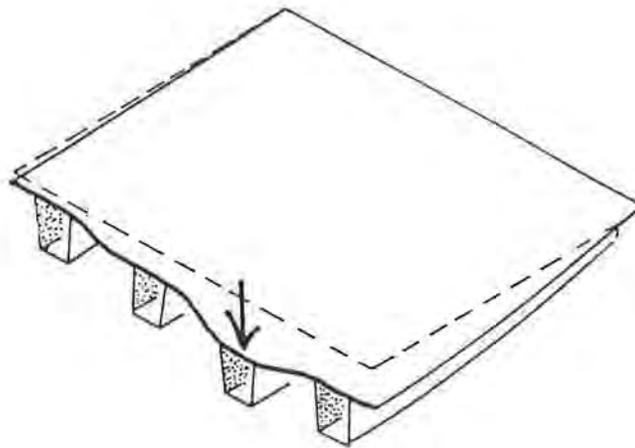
Spaced Beam-and-Slab Deck Deflecting in a Series of Steps or Waves (16)
